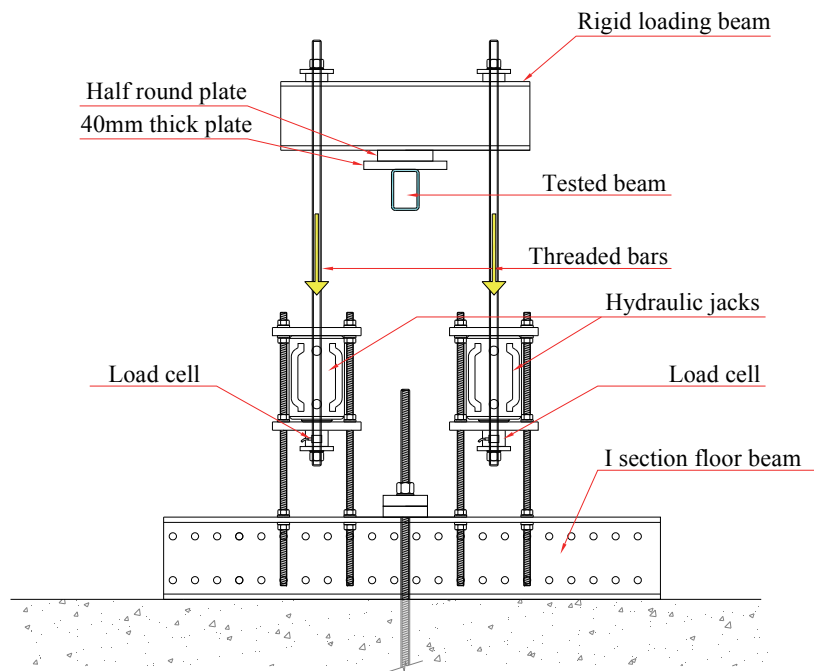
Test setup of the 3-point bending beam, transversal view (dimensions in *mm*)
